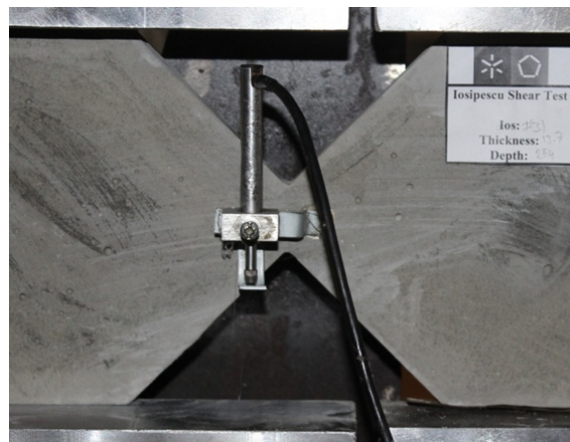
The position of the LVDT to measure sliding of the shear crack at notched section
